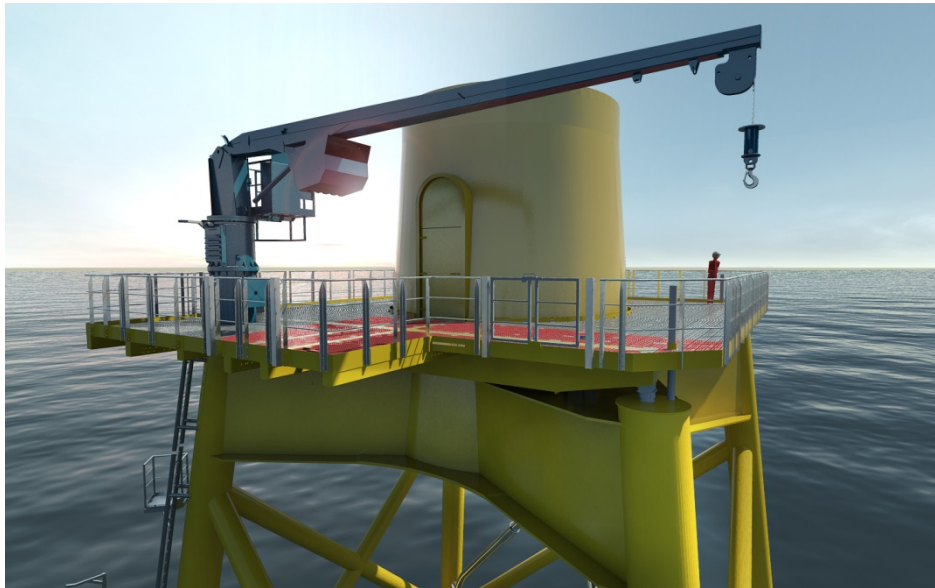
Box girder model with external platform placed on top of the top girder [Belwind Jacket]
